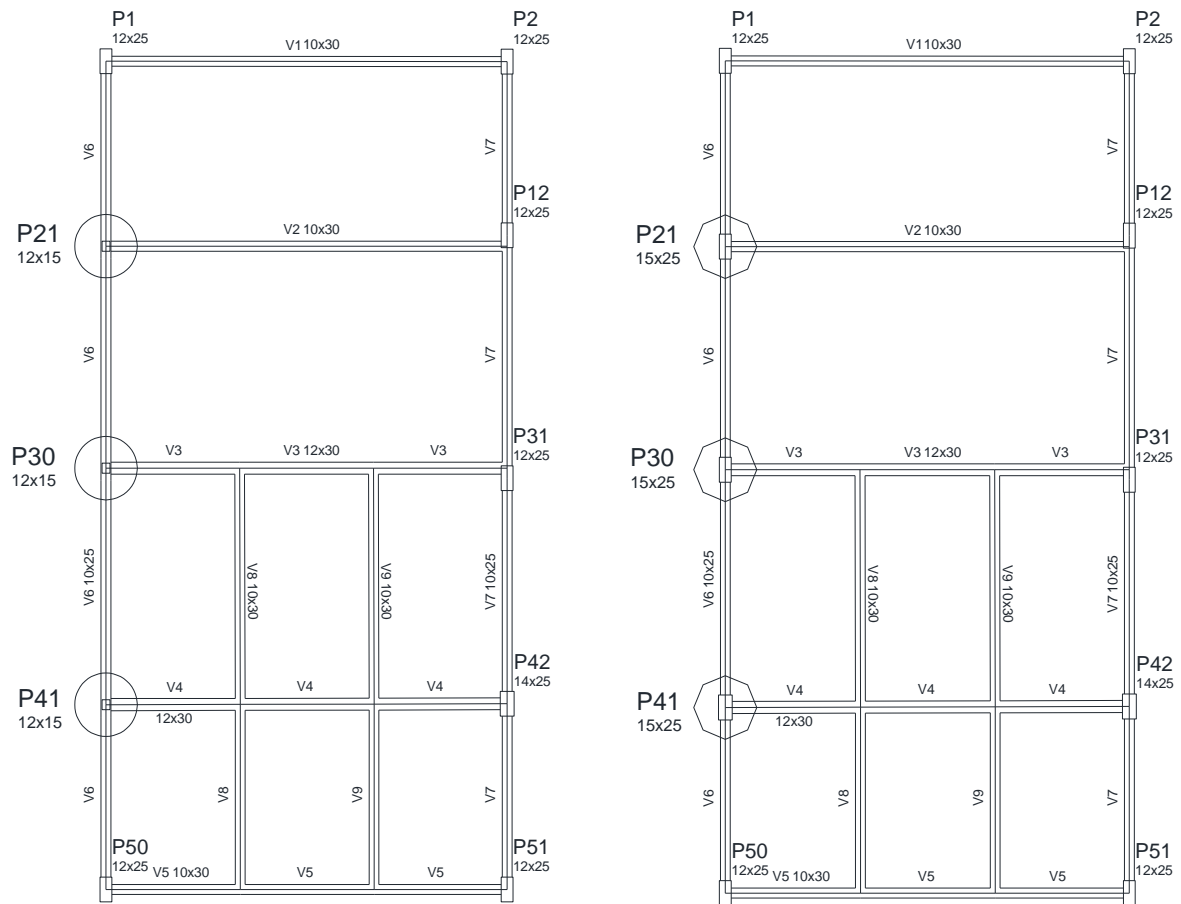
Location and dimensions of columns P21, P30 and P41 before and after structural strengthening (right).
